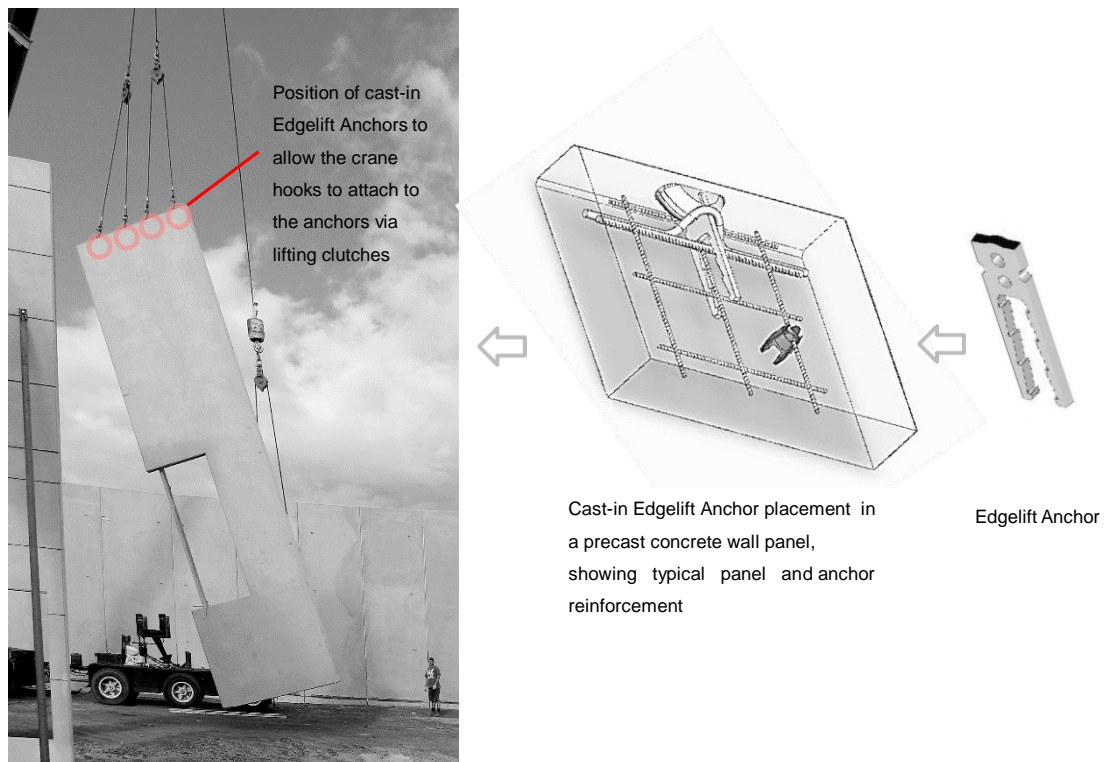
Concrete wall panel being lifted, and placed vertically into the building structure
